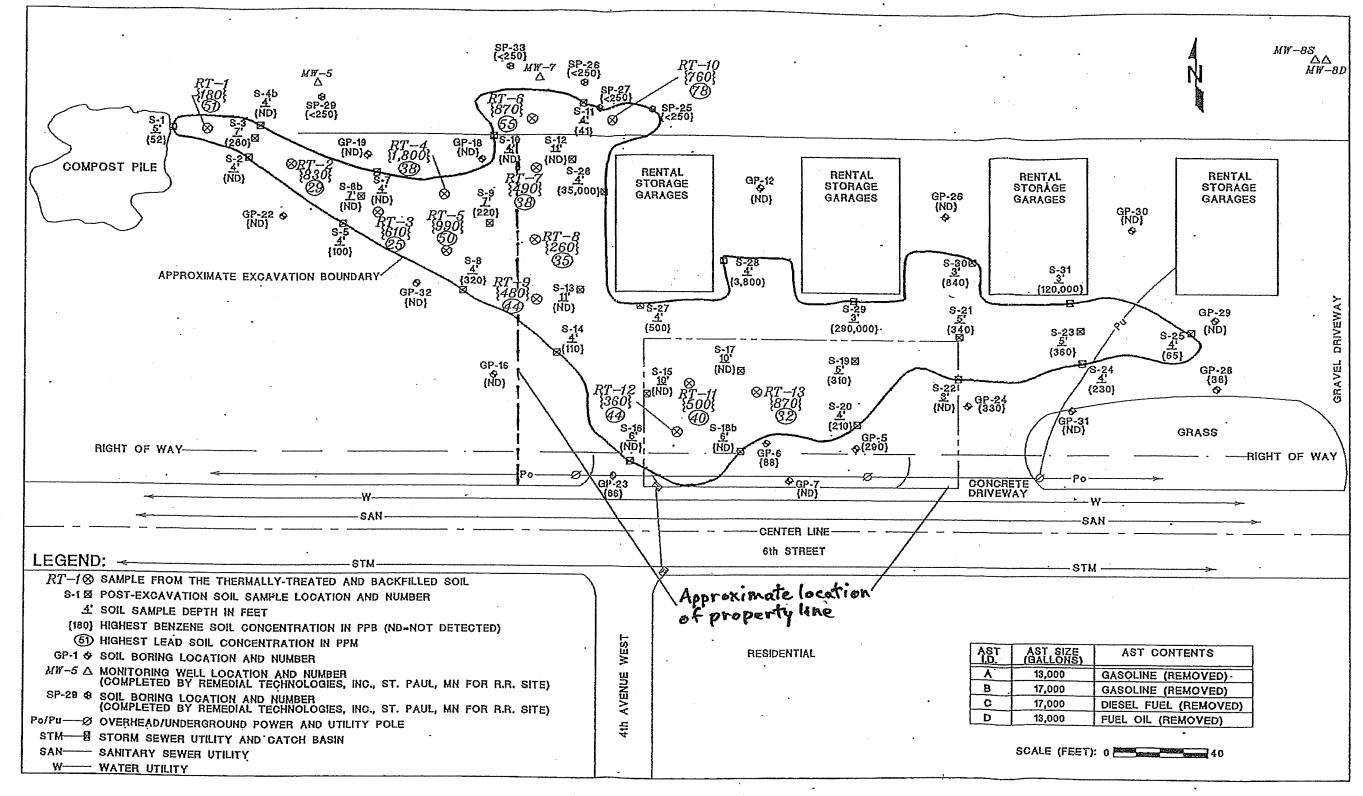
EXCAVATION DETAIL AND SOIL POST-EXCAVATION SAMPLE LOCATIONS
